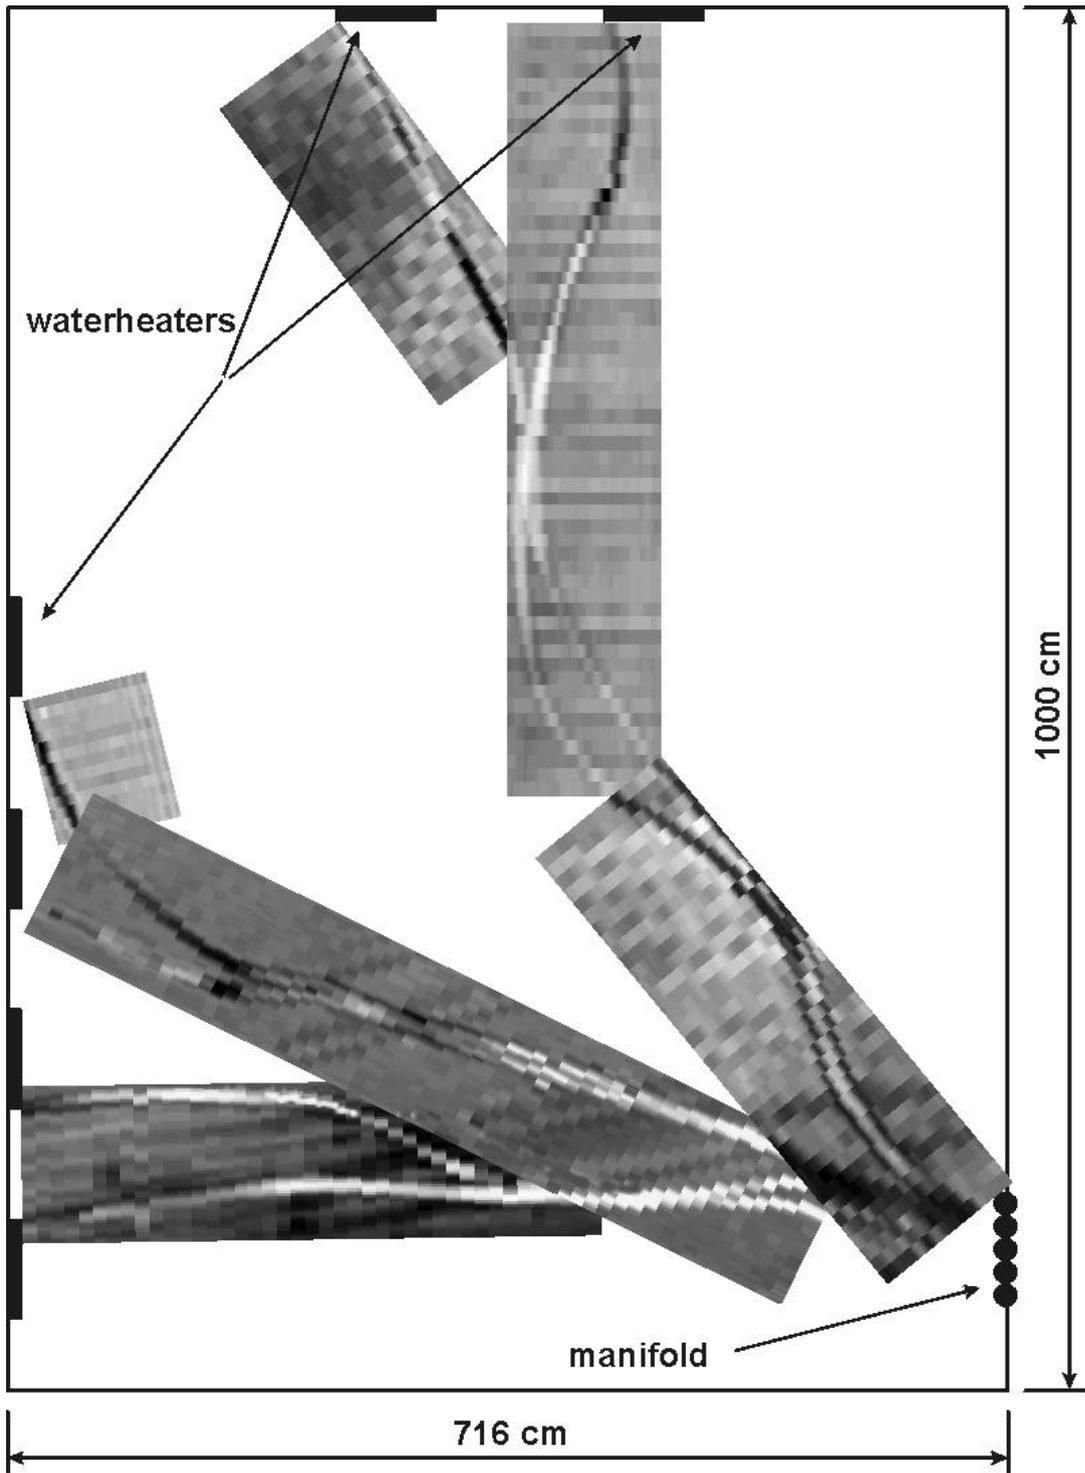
Radio-image of plastic tubes under a concrete floor covering.
